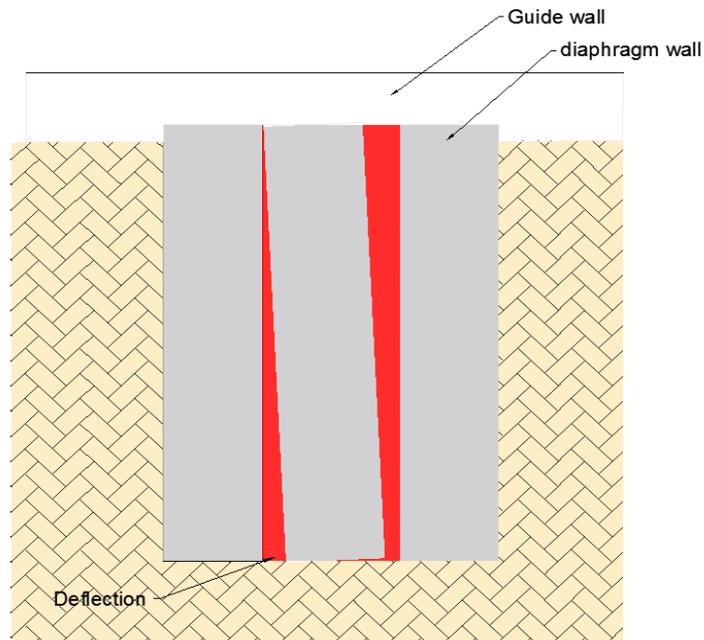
Cross section view Diaphragm wall Deflection concept at higher depths
